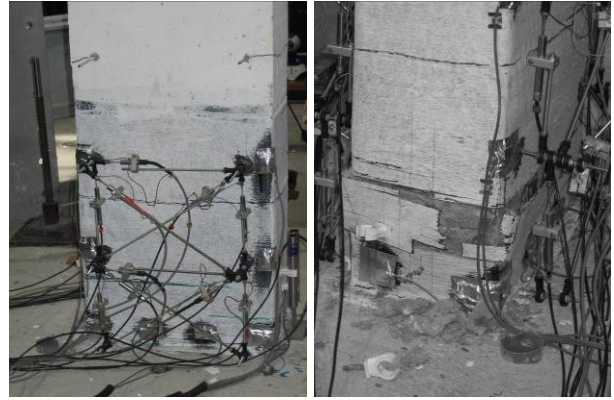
Damage on the retrofitted specimen: flexural cracking (left) and failure of the CFRP jacket (right).
